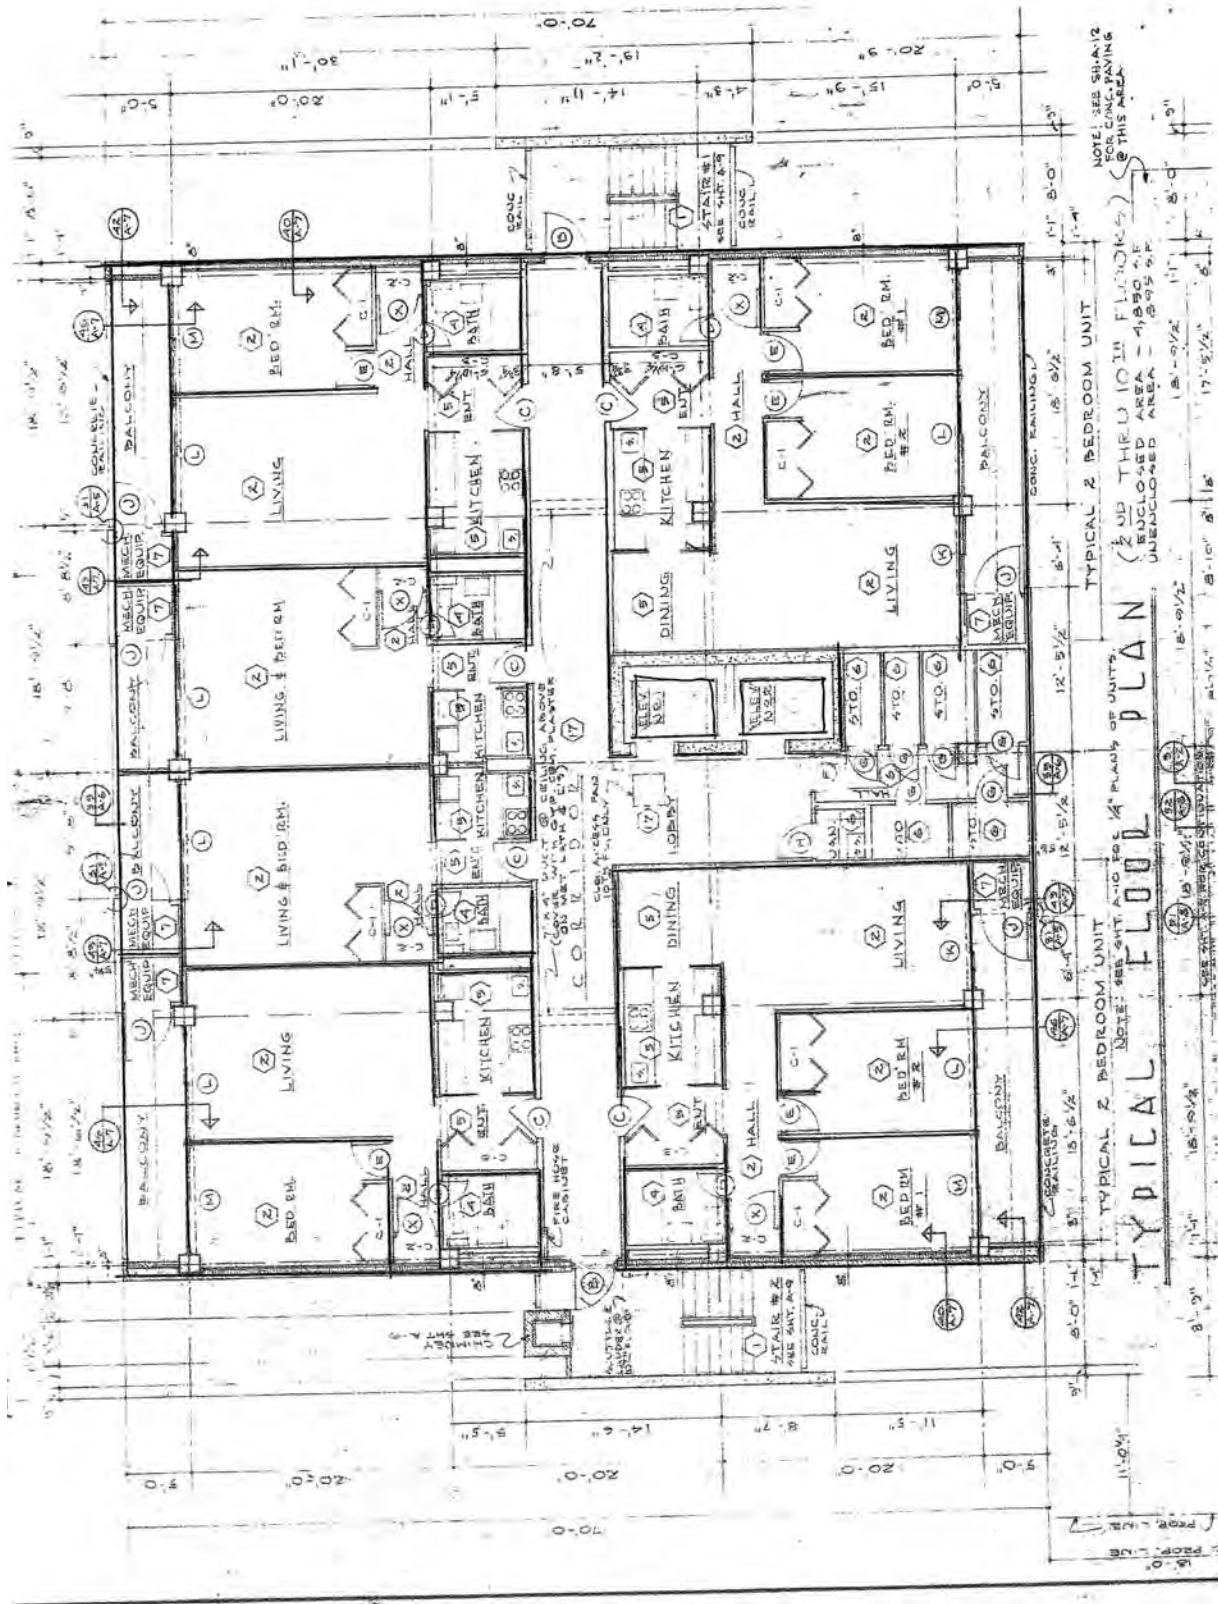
Original Floor Plan for Bristow Tower showing the layout of the residential floors. Image courtesy of Mathes, Bergman, and Associates.
